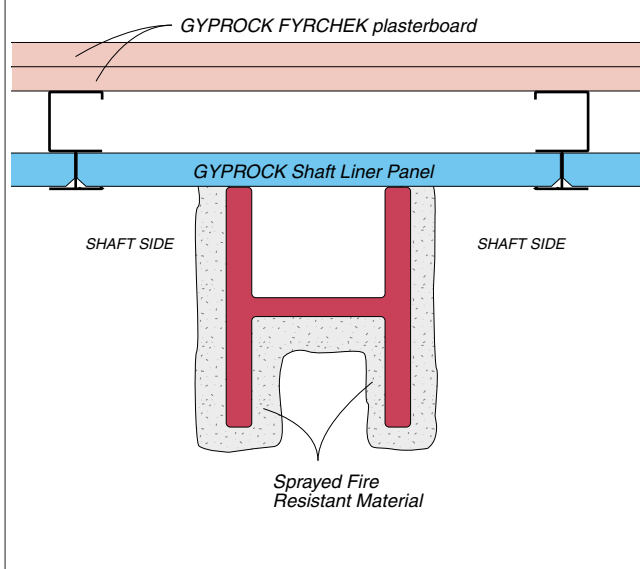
WALL BYPASSING UNIVERSAL COLUMN
